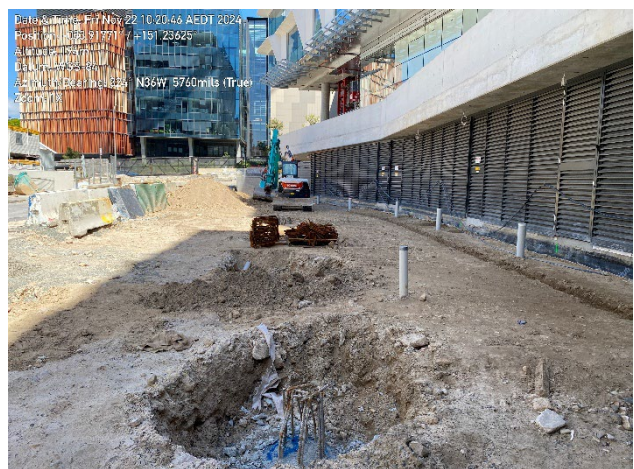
Hosing strung along building exterior for wetting down soils during digging and placement for new driveway ramp.
